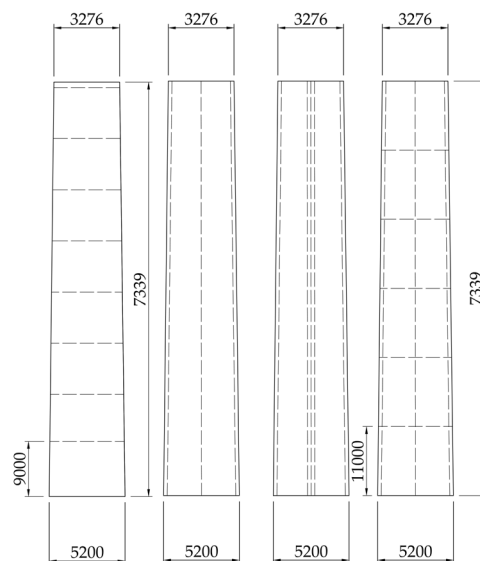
Geometric data of the towers with the four stiffening schemes (in mm).
